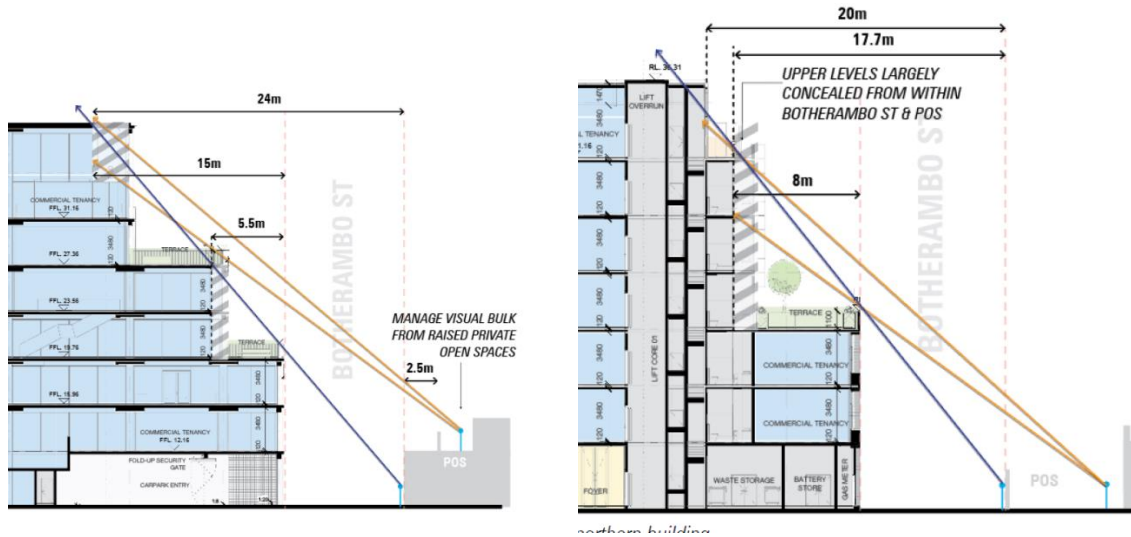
Recommended (and adopted) upper level setbacks where facing Botherambo Street Northern and southern buildings respectively.
